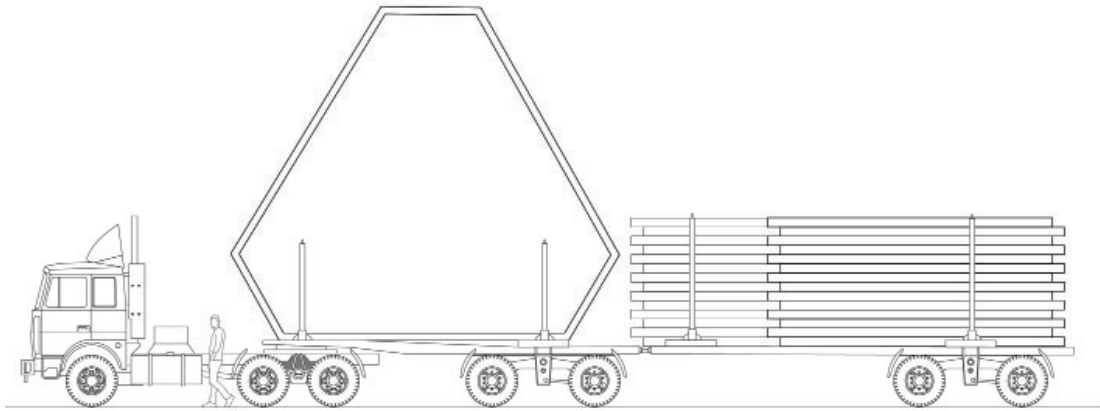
Structural Diagram: Logging Truck Carrying Structural Members
